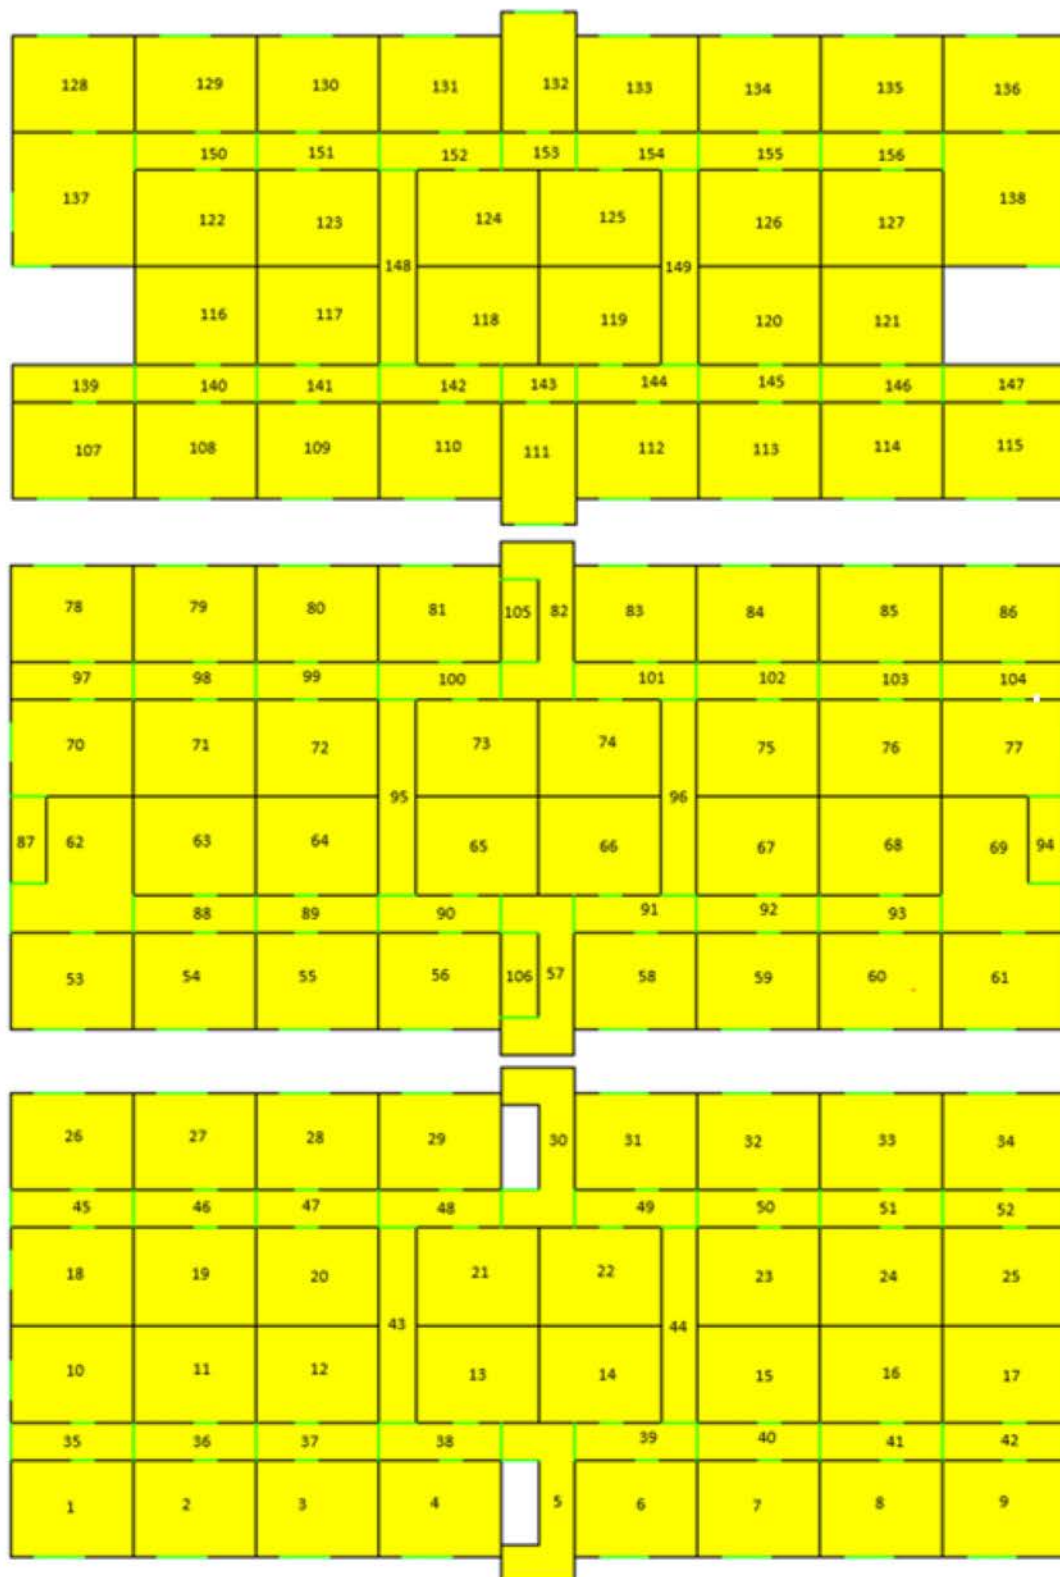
3-floor building layout with room numbers. From top to bottom the diagram shows the 2nd, 1st and ground floor.
